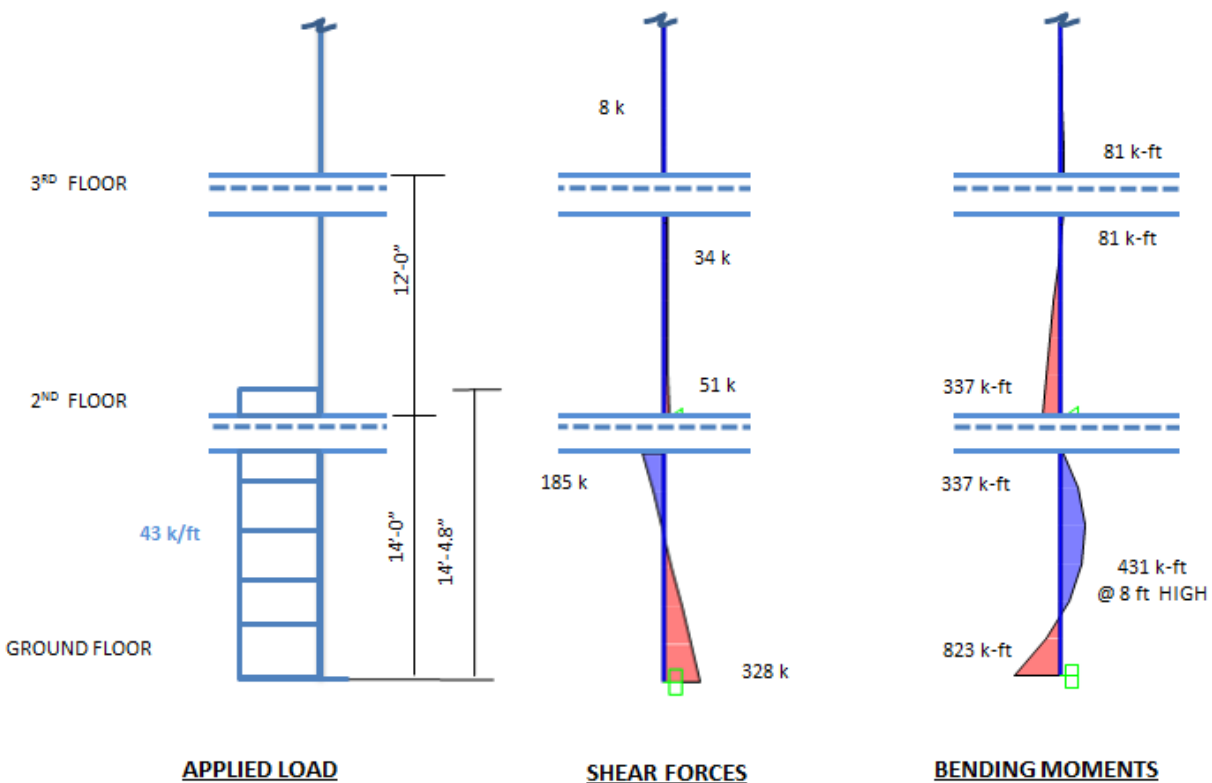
Hydrodynamic loading on exterior column of the Monterey office building due to Load Case 2
